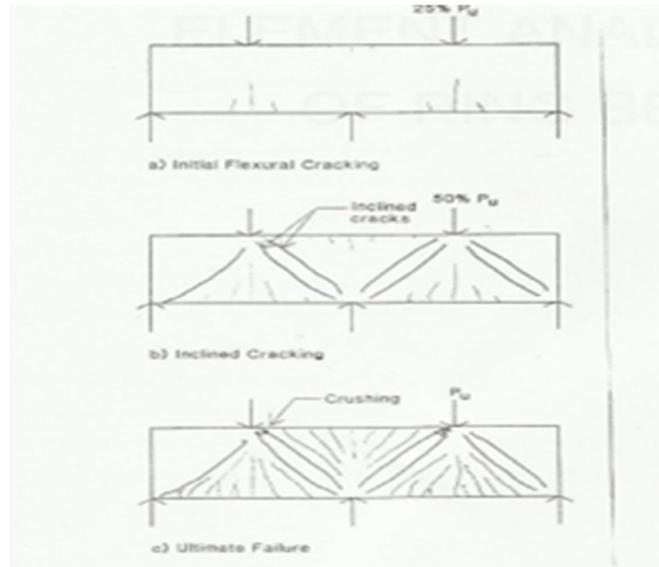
Typical continuous deep beam cracking behaviour
